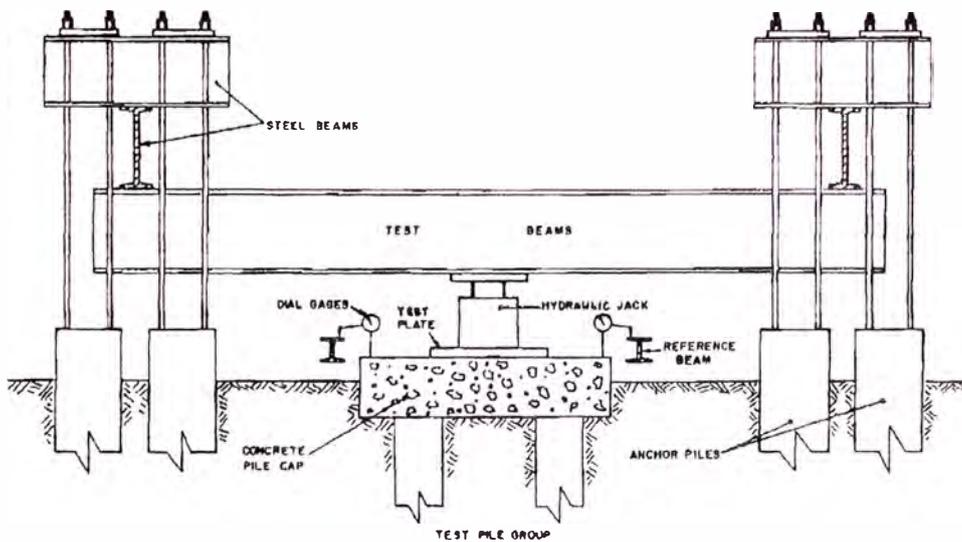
Schematic Set-Up for Applying Loads to Pile Using Hydraulic Jack Acting Against Anchored Reaction Frame
